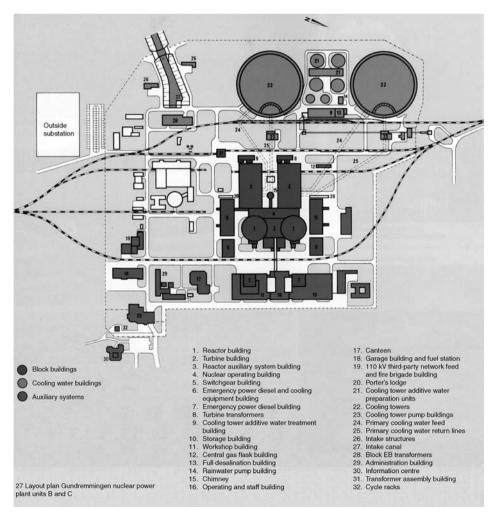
Layout plan of Gundremmingen nuclear power plant [17]
